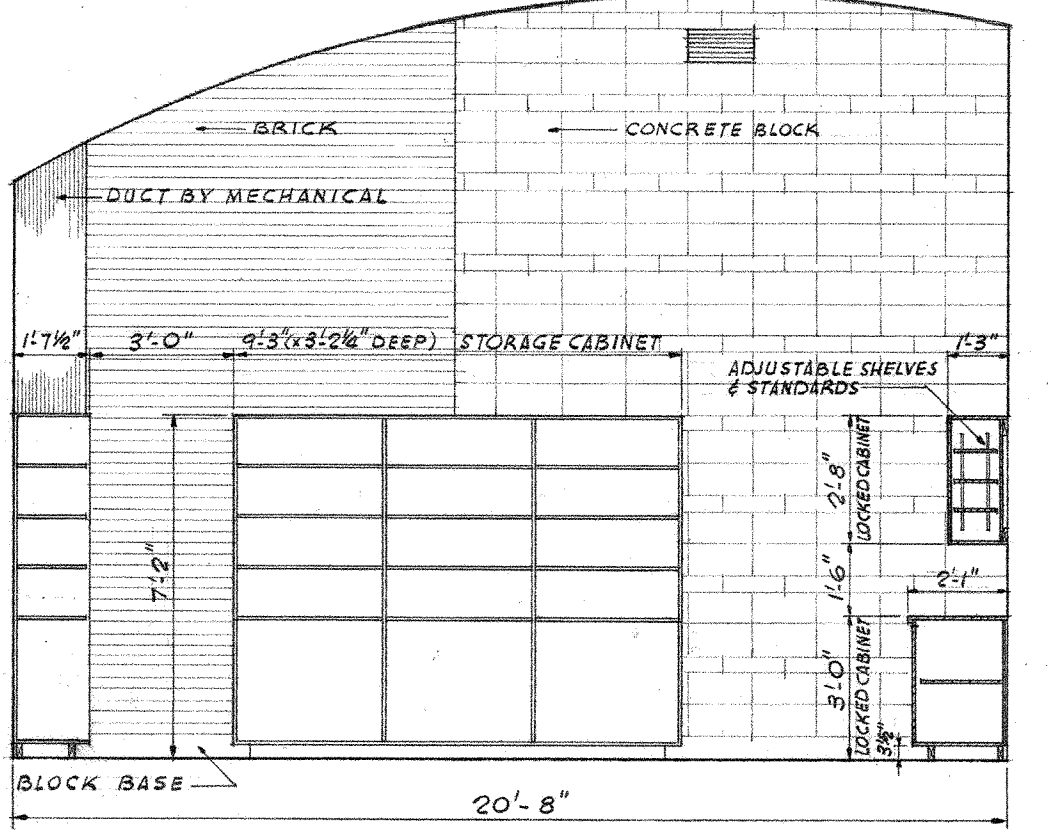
DETAILS OF TYPICAL CLASSROOM (CLASSROOM 4104) (OTHERS SIMILAR) UNITS: A & C
